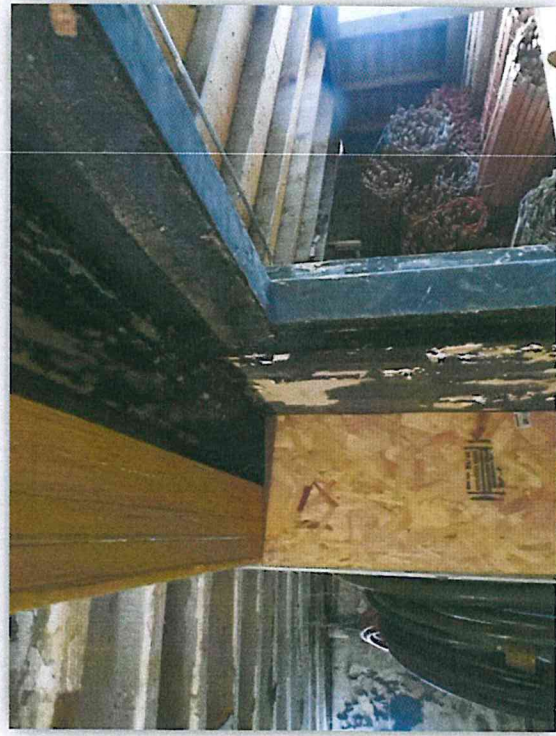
Attempt to Repair Sill Beam/Header at Door
